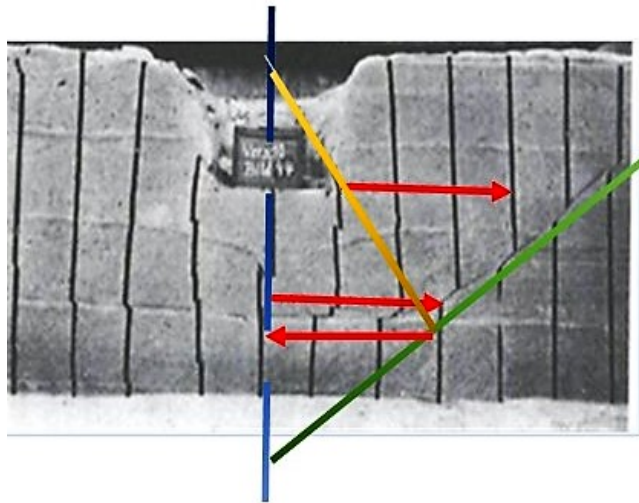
shows a shallow single foundation in non-cohesive soil, built on a rigid concrete floor.
